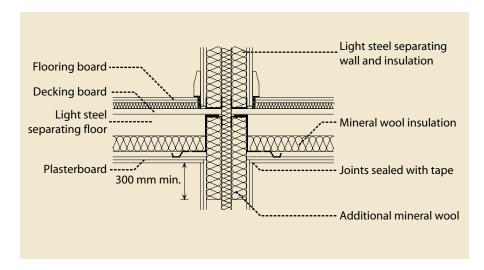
Acoustic build up of light steel floor and its detail at a separating wall
